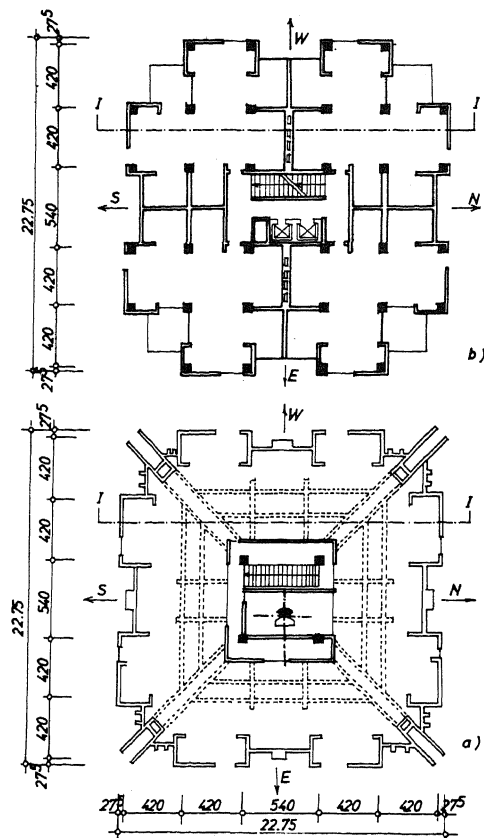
PLAN OF THE ROOF WITH THE EXITER LOCATION, 1b. PLAN OF A TYPICAL FLOOR
